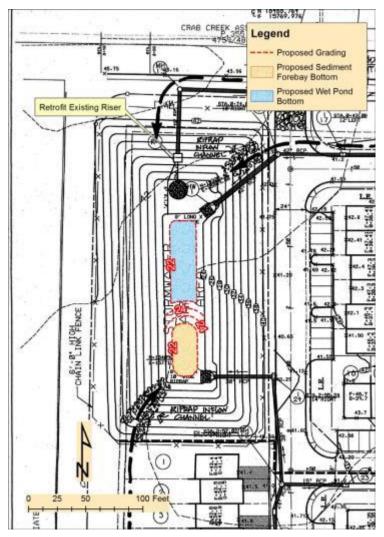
Proposed Retrofit Concept Design Detail Based on Greenhorne & O'Mara Inc. 1994 Design Plan
